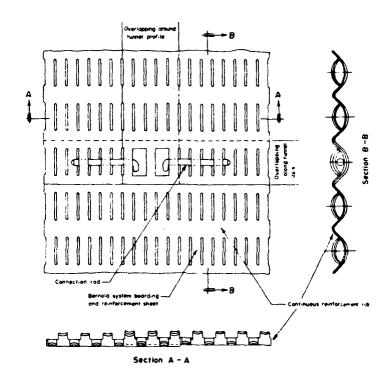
FIGURE All- Bernold System Boarding and Reinforcement Sheet (Bernold, Jean, 1970; given in Nussbaum).
